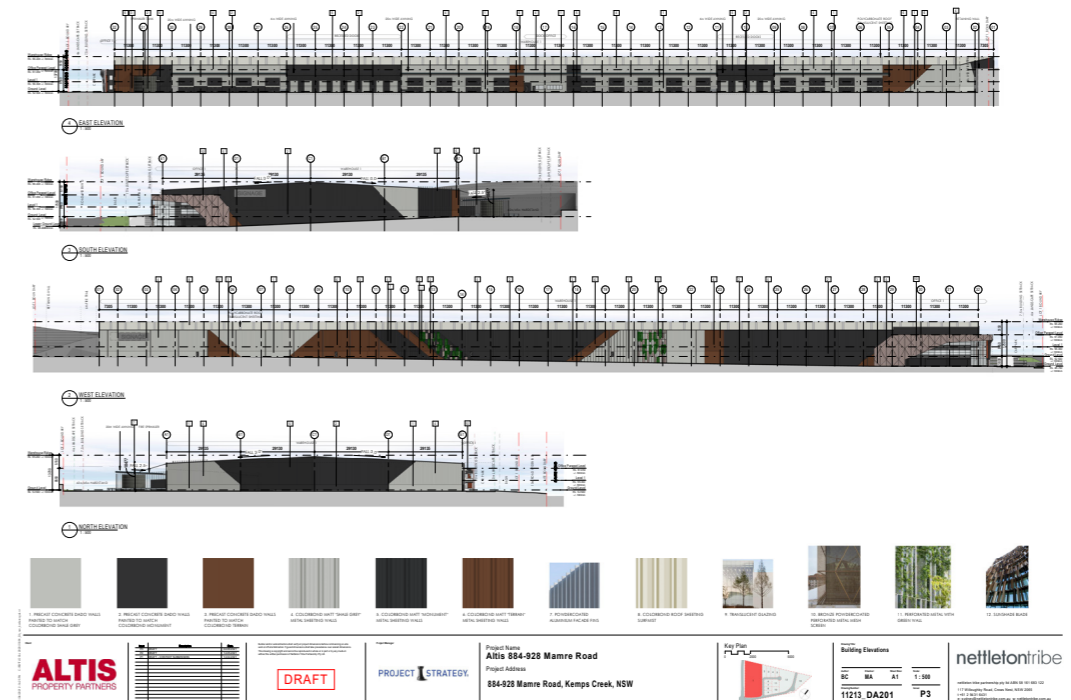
Typical Warehouse Elevations - (Source: Nettletontribe)
